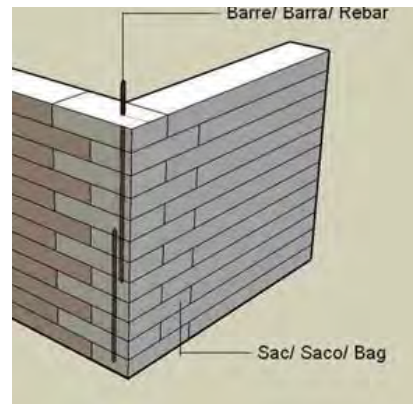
Corner Reinforcement Using Rebar (Hart, K. & Geiger O. (n.d.)).
